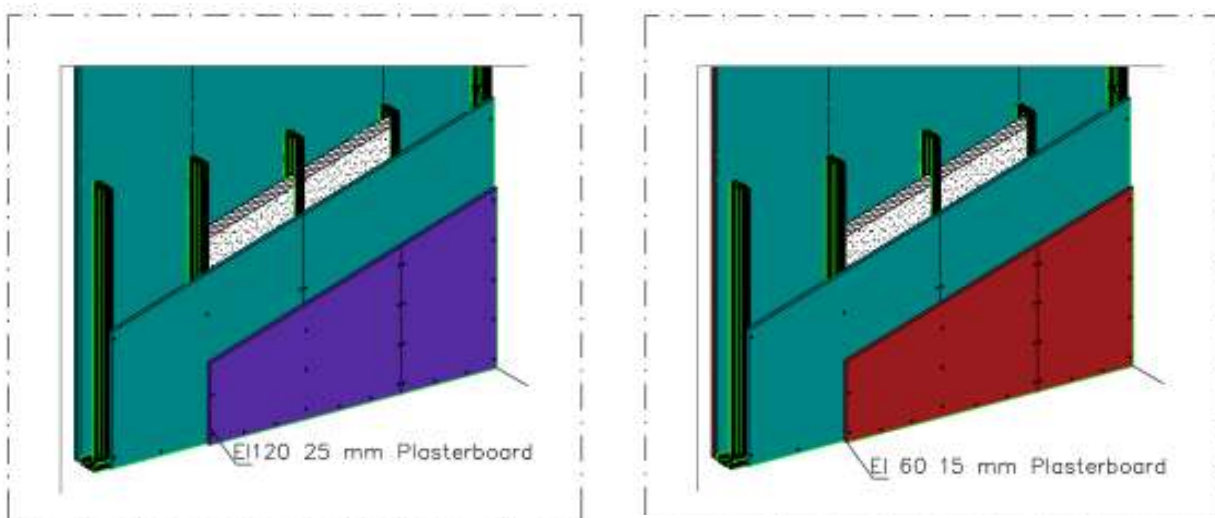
&6. Systems for Wall constructed by mounting one layer plasterboard over existing wall
